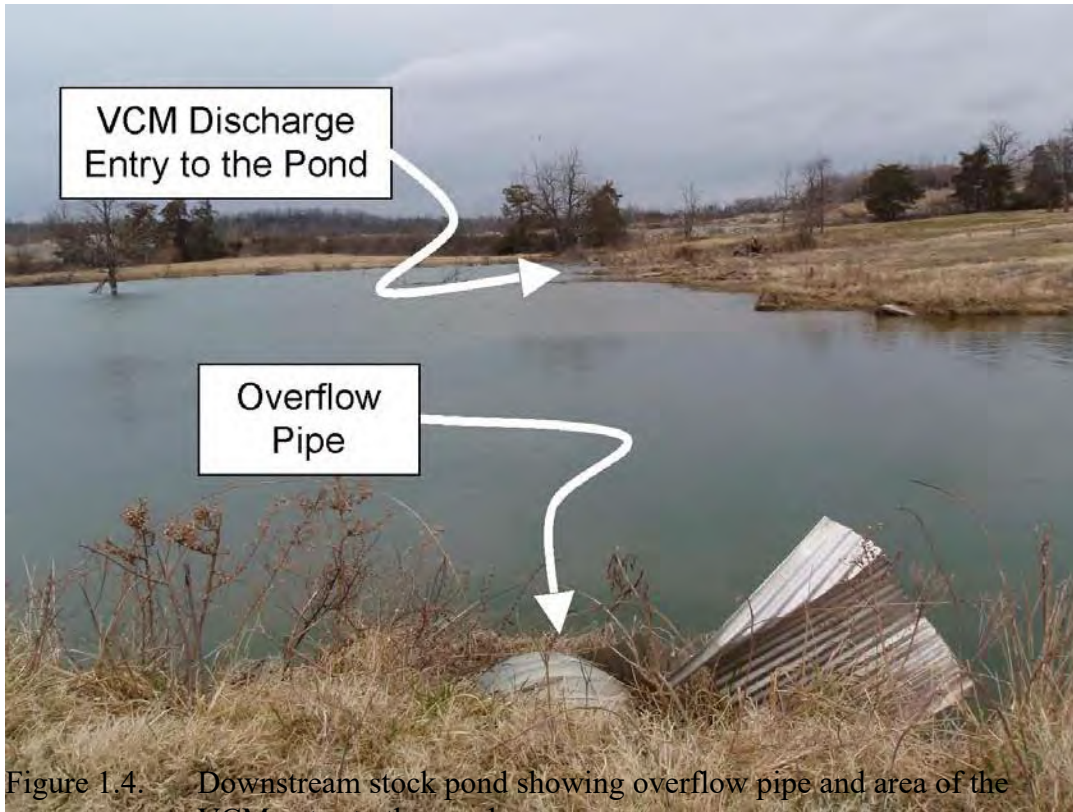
Downstream stock pond showing overflow pipe and area of the VCM entry to the pond.
